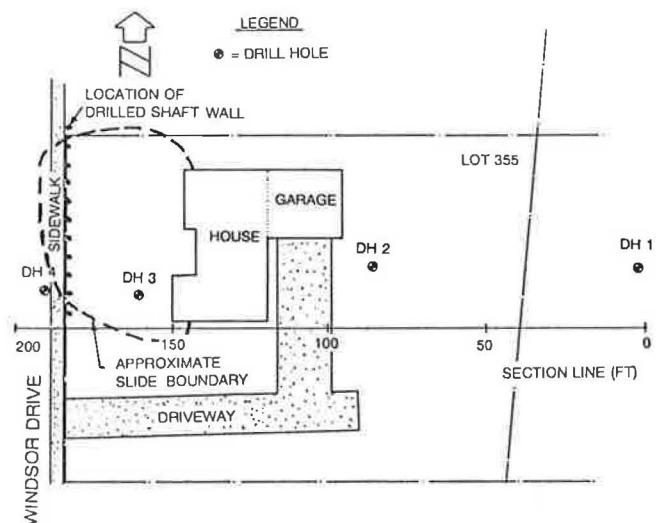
Plan view of Windsor Drive Slide 2 and drillhole locations.
